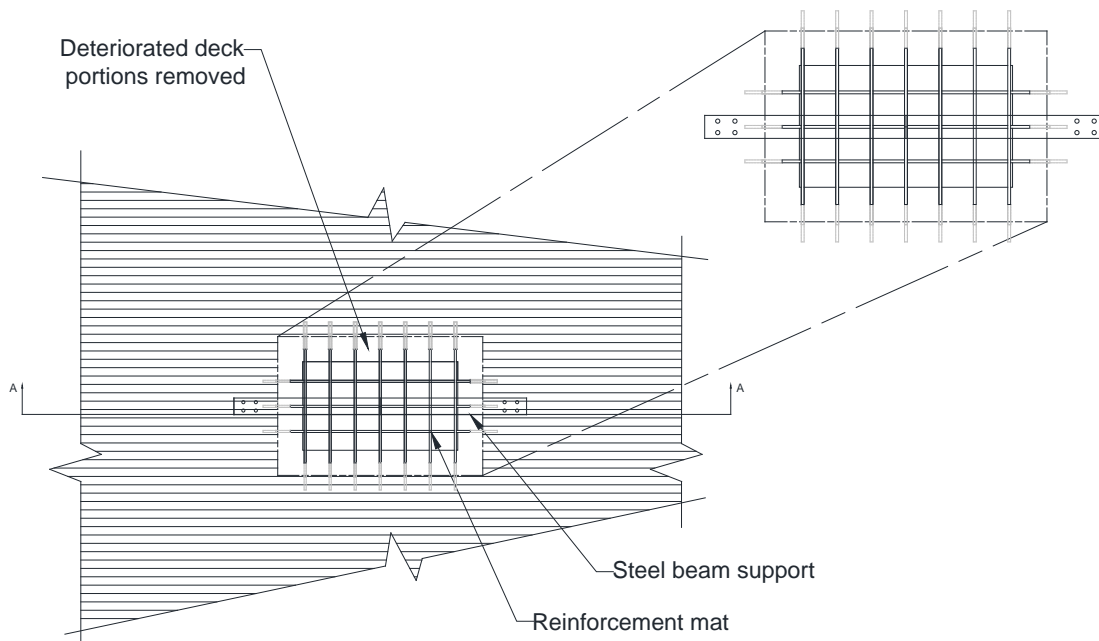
Full-depth laminated deck repair of larger area – plan view
